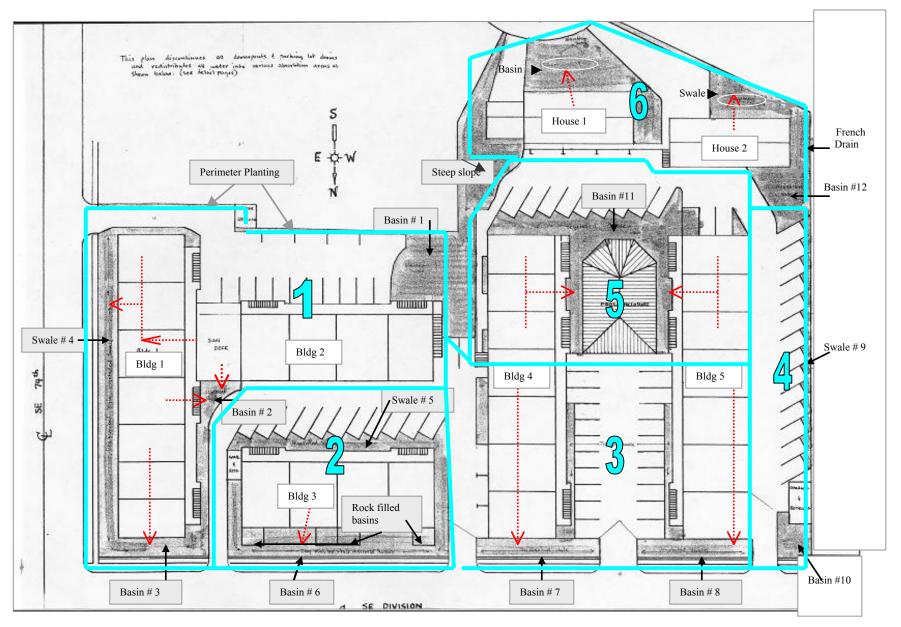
Plan of the apartment complex with the locations of the stormwater management facilities. The red arrows indicate the direction of travel for runoff from the roofs.
